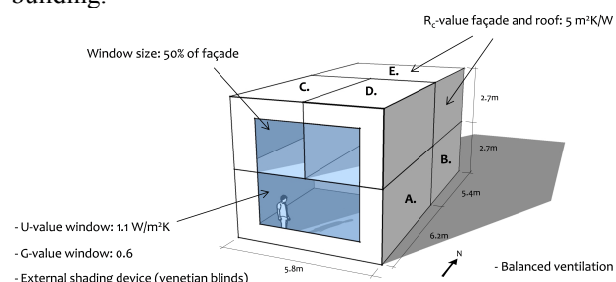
Geometry of the case study building with several building characteristics. Facing the south façade.
